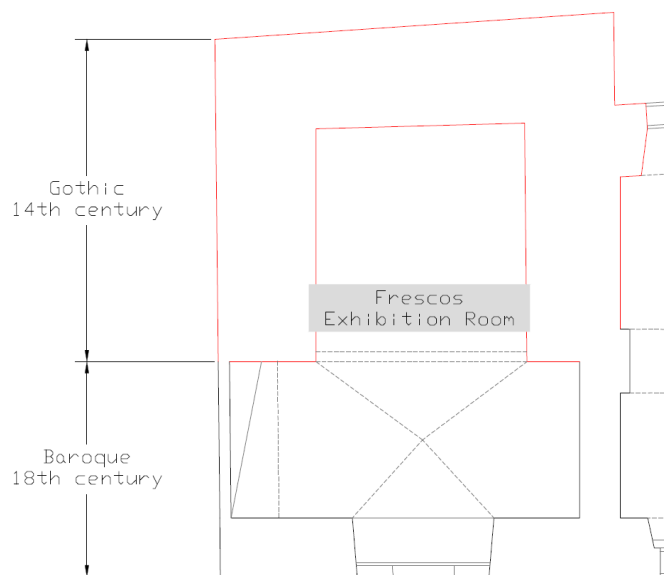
Floor Plan of the Frescos room separated according to the date of construction assumed by the architectural style
